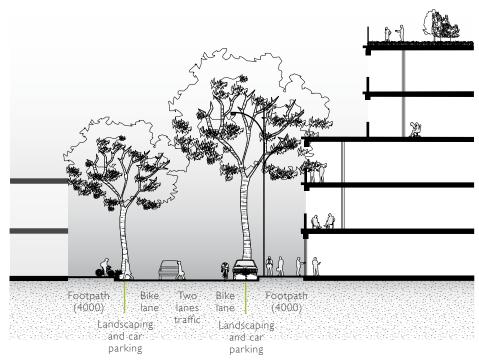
INDICATIVE CROSS SECTION OF A GREEN STREET - CONNECTOR BOUNDARY STREET
